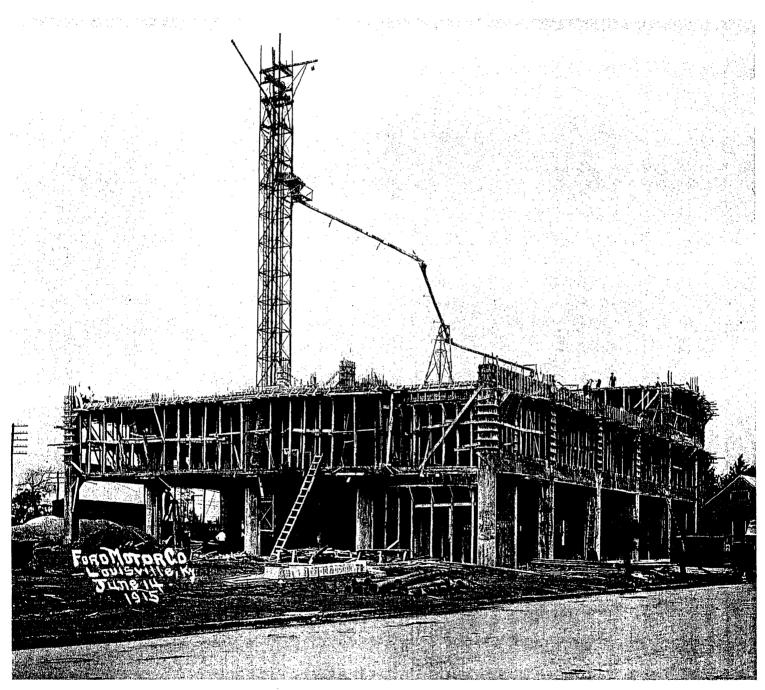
Construction photo 1915. Note single story house to the far right Ford Motor Company Archives.
